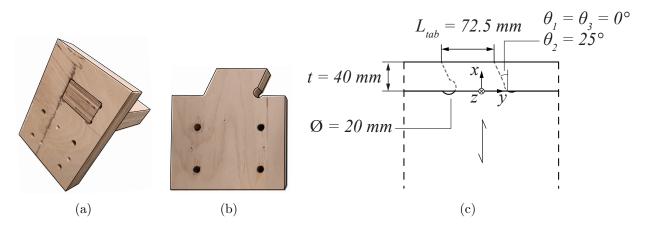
Geometry of the through-tenon joints tested: wood-wood connection (a) panel with tenon (b) and geometry of the connection (c)
